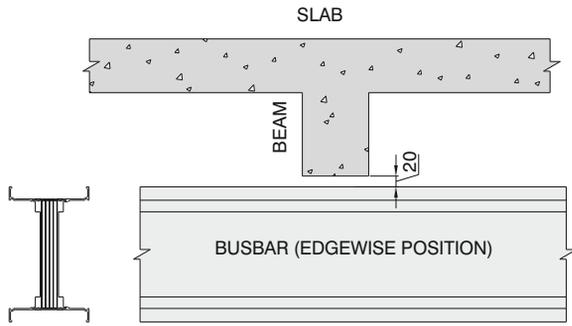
CROSSING UNDER A BEAM EDGEWISE POSITION
